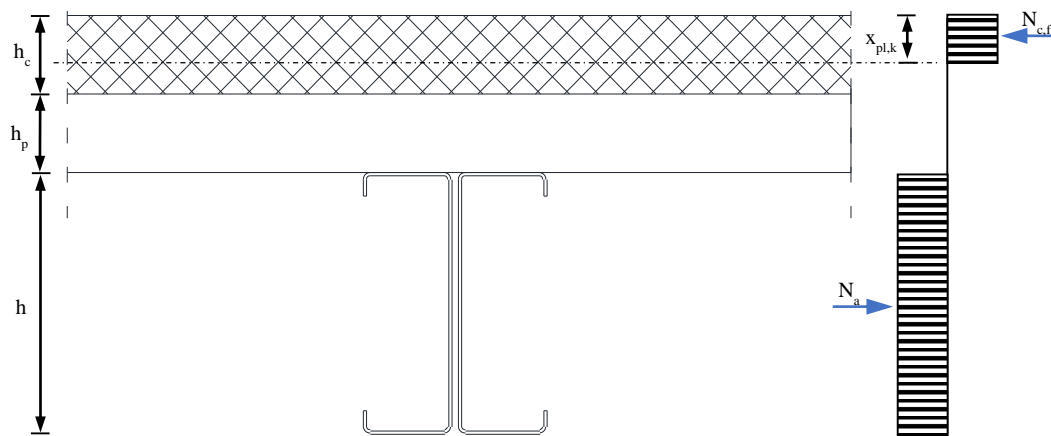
Cross section of the beam with concrete slab on profiled metal sheet
